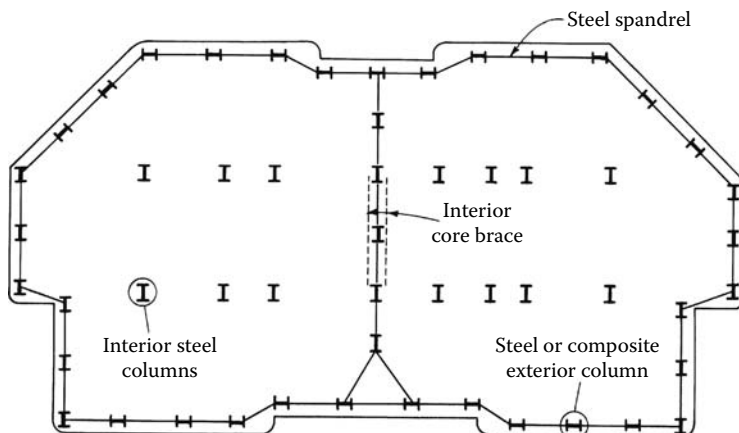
Framed tube with 15 ft column spacing.
